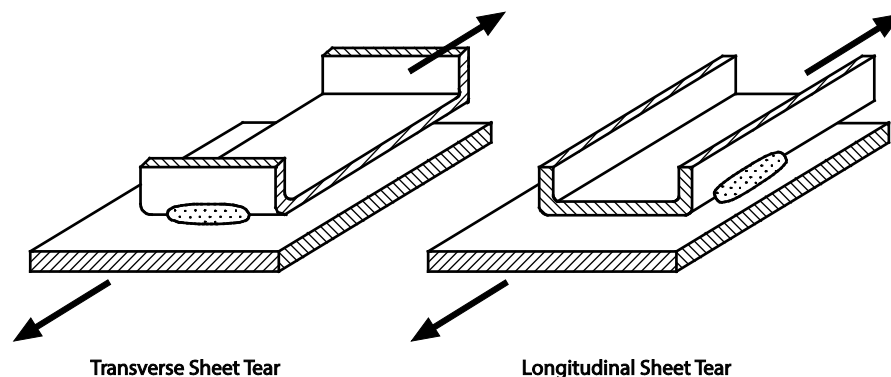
Flare Groove Weld Failure Modes
